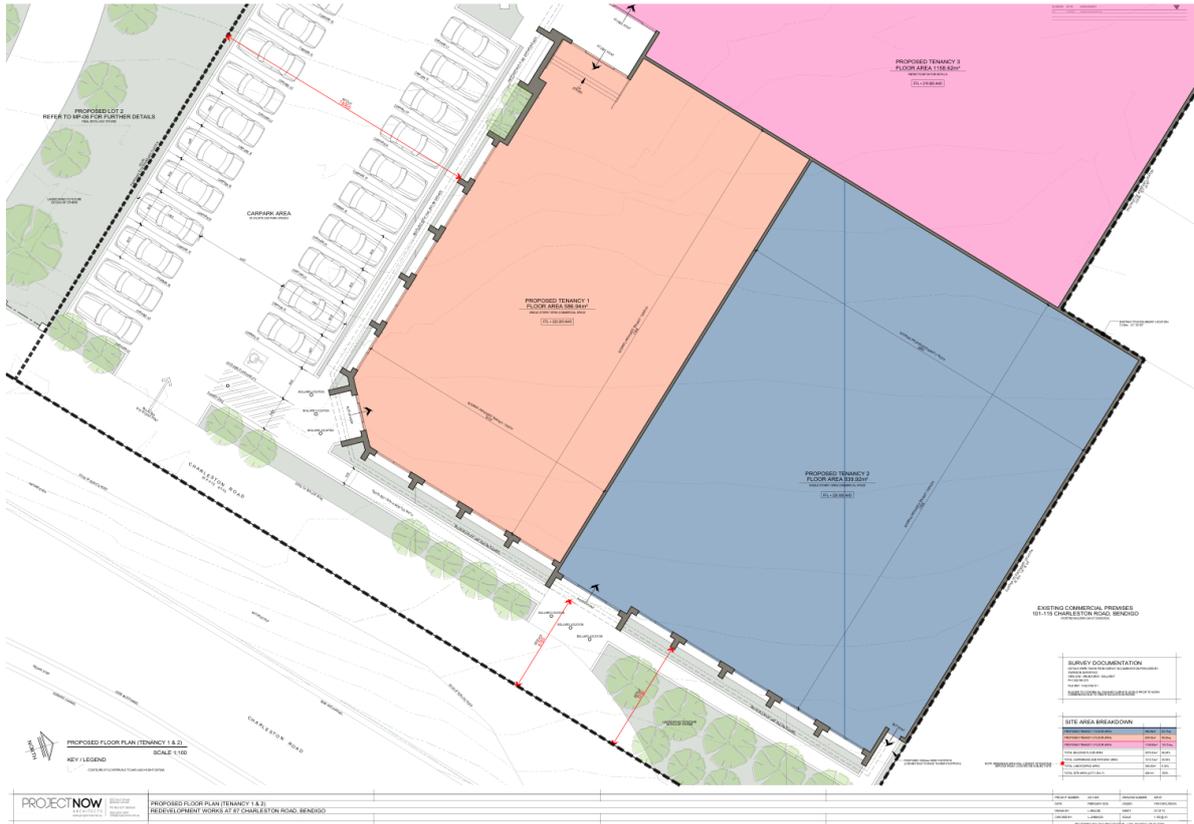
Enlargement of the master plan showing the south and centre of the site
